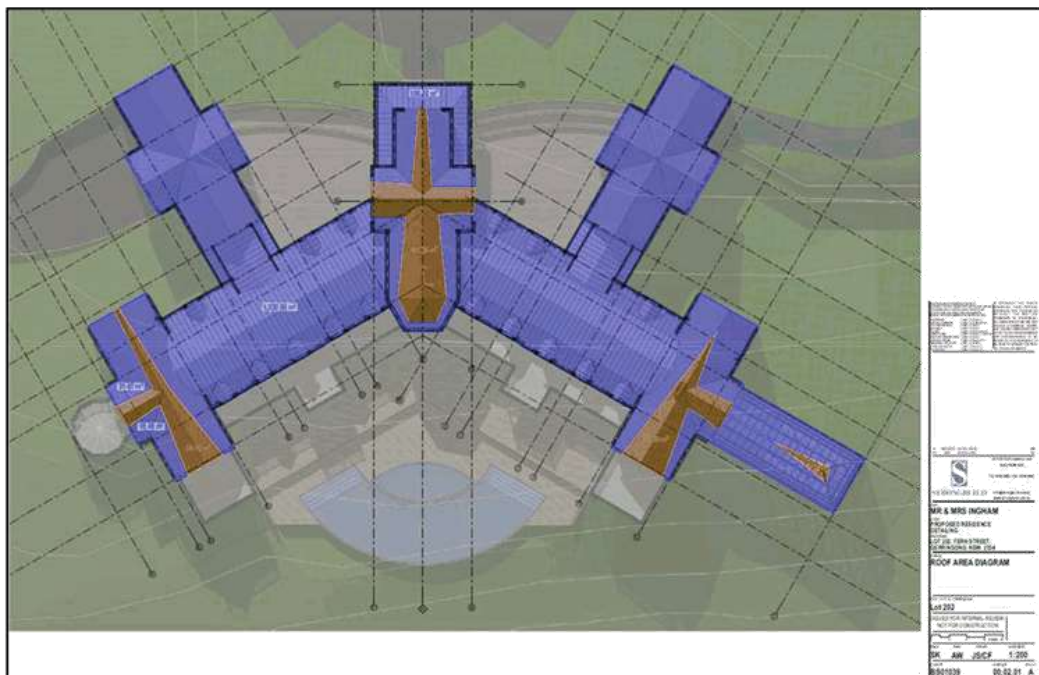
Plan of roof of proposed principal dwelling-house showing exceedance of 8.5 m height limit
